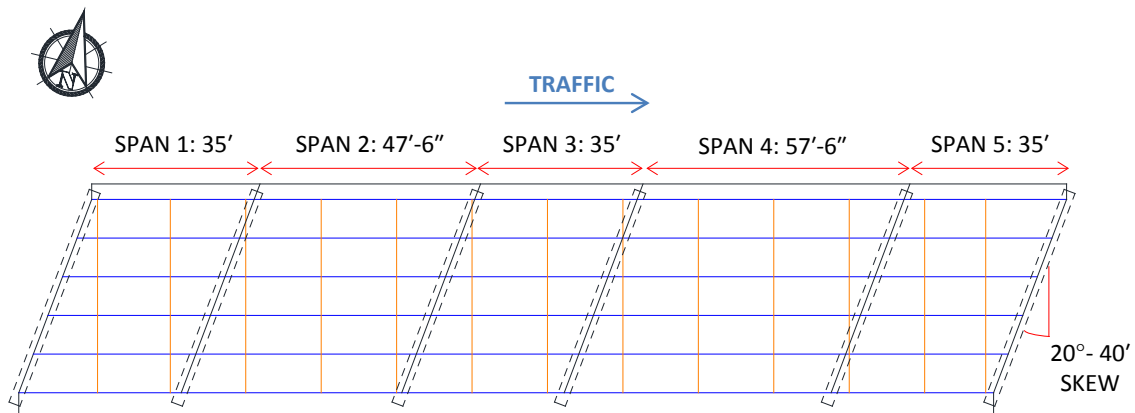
Dimensioned plan view of the TX-71E Bridge.
